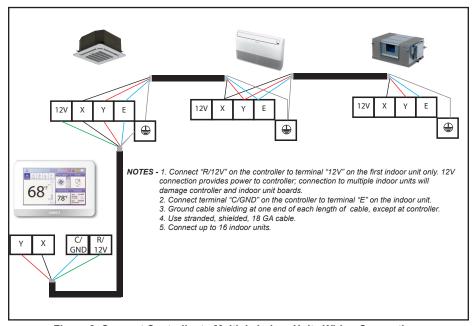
Connect Controller to Multiple Indoor Units Wiring Connections
